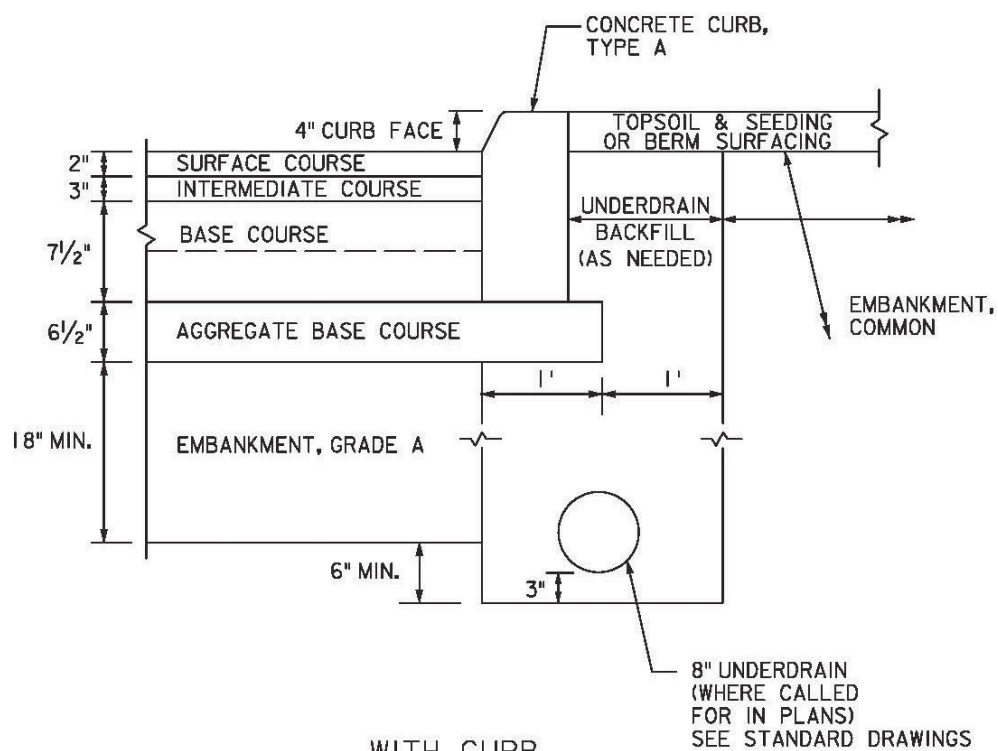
Turnpike Transverse Pavement Stepping Detail
